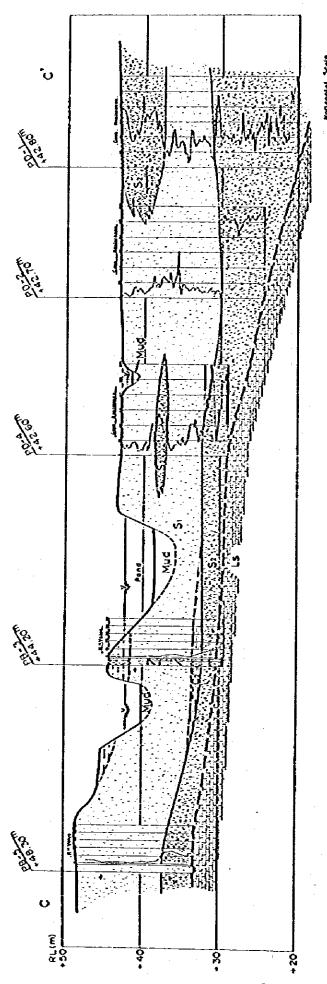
Soil Profile at Kampong Pandan, Cross Section B-S
